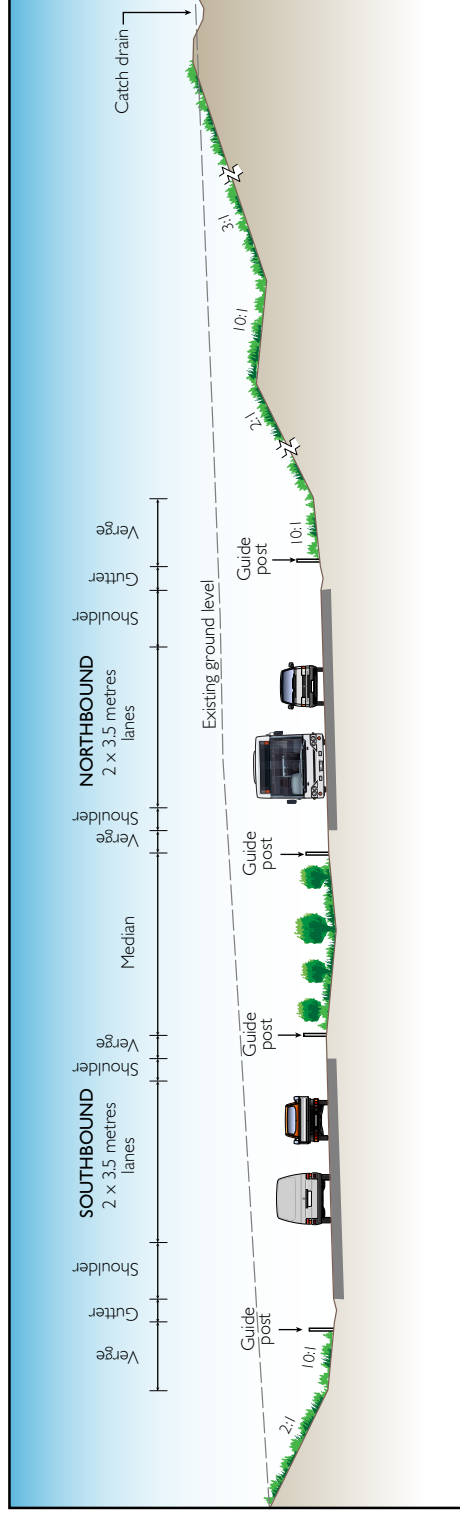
Indicative alignment cross-sections – shallow and deep cuttings
